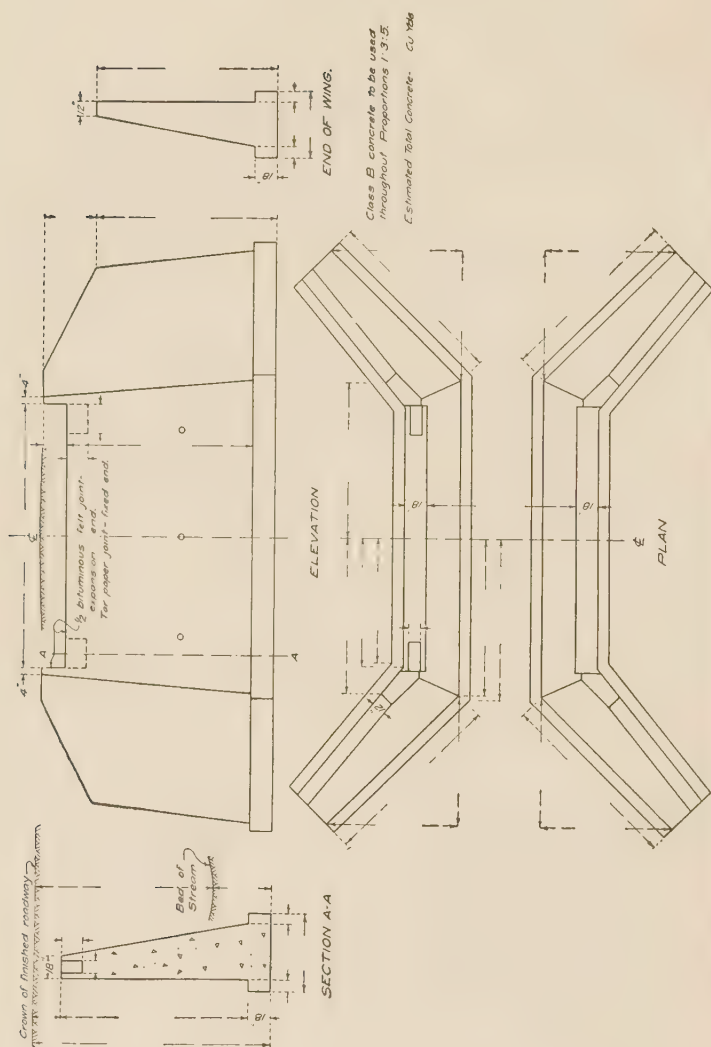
Plain concrete abutment for girder bridge, Illinois State Highway Department.
